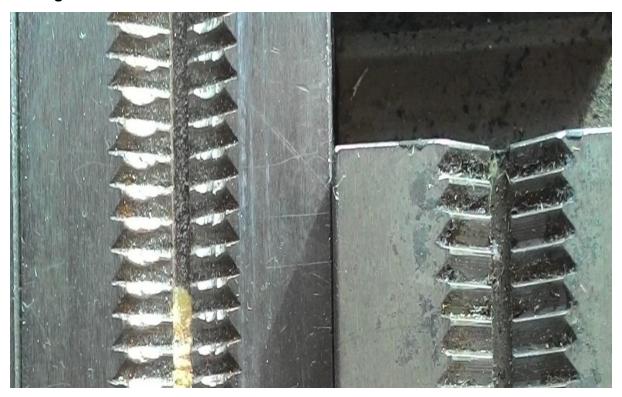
Extensometer BFRP Rebar Inside The Testing Machine
